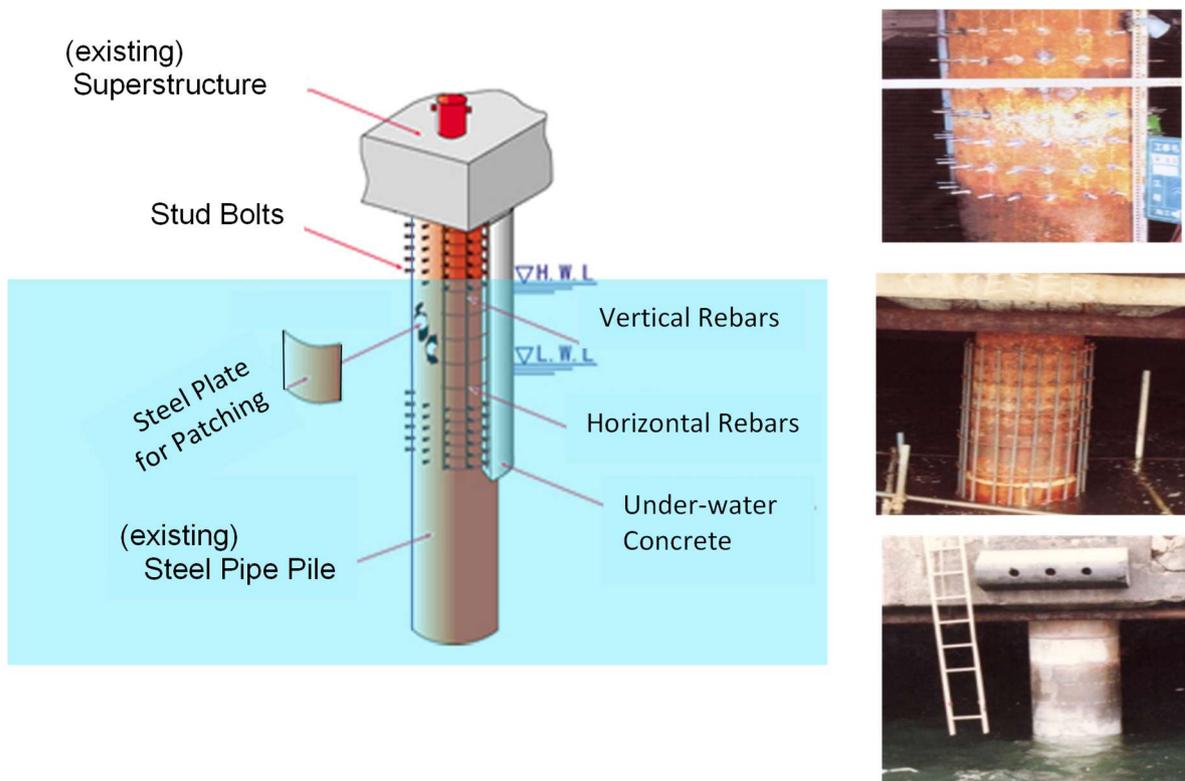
Example of repair and strengthening of steel pipe piles by jacketing with reinforced concrete
